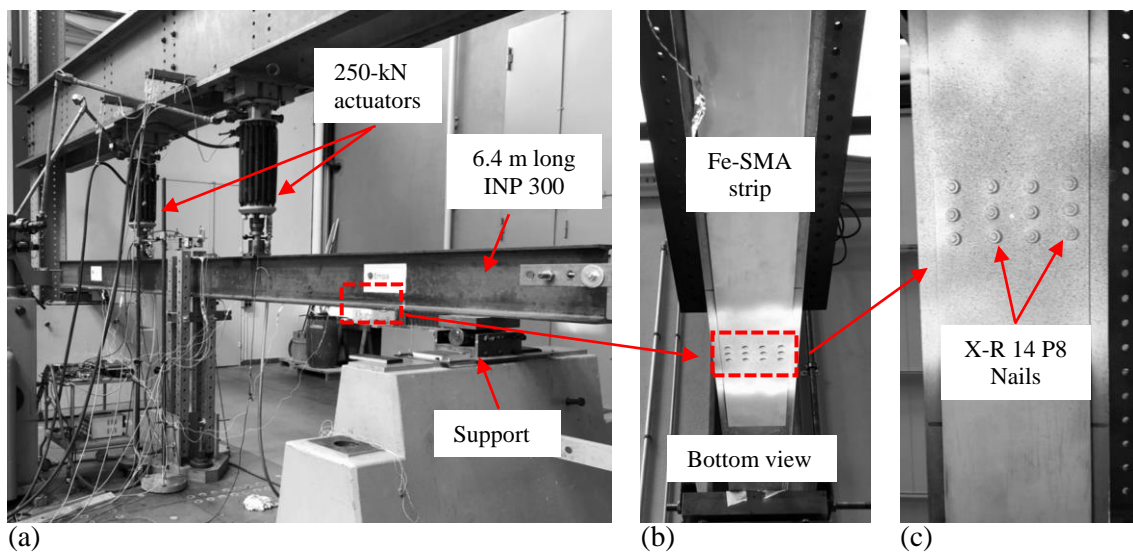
(a) Four-point bending test setup, (b) the Fe-SMA strip fastened to the steel I-profile, (c) the nail-based anchorage.
